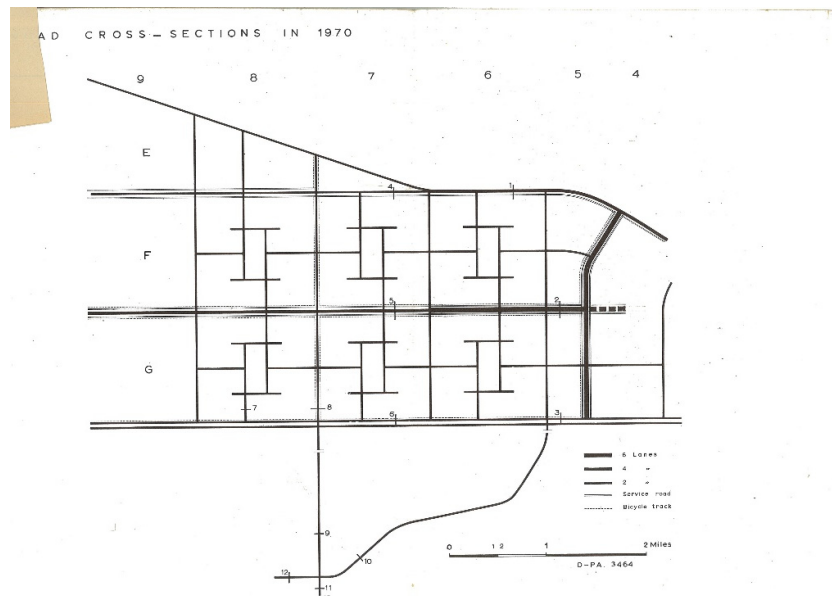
Road Cross Section in 1970. Source: Islamabad Traffic Width of Roads and ROW Program and Plan, D-PA 3464
